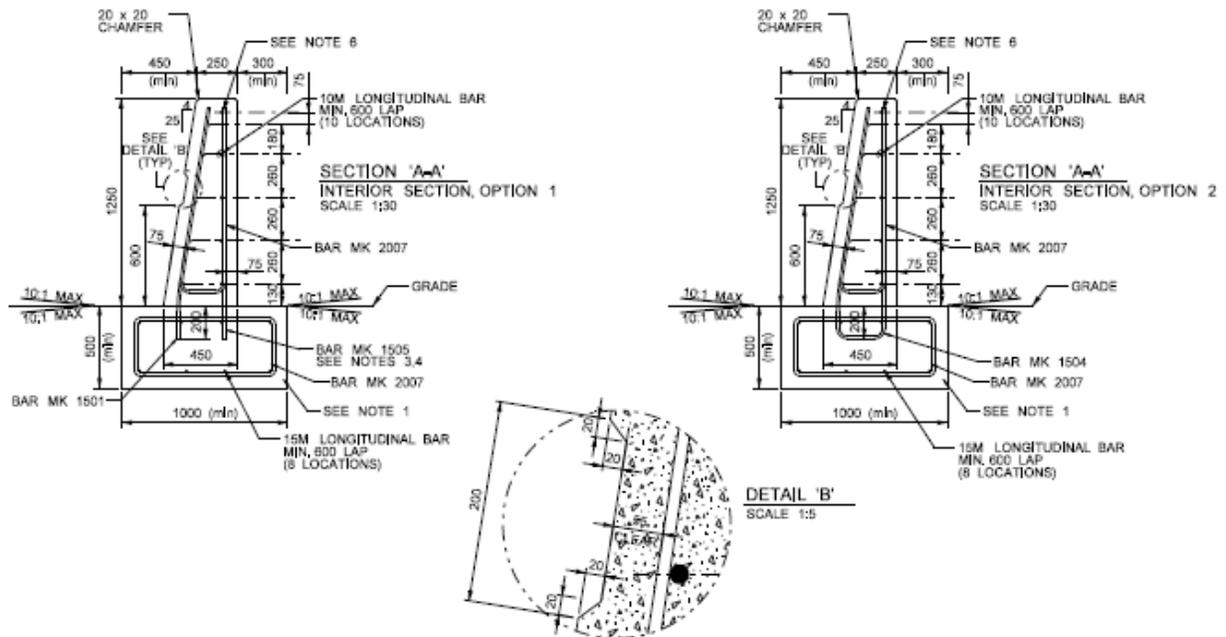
Cross section views of the end section roadside barrier, footings and anchorage options
